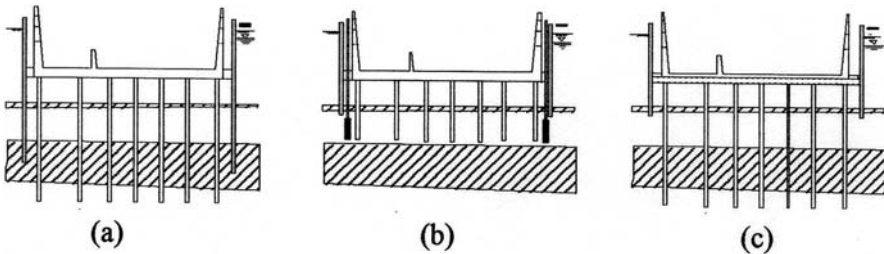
Underpass mr Bierensweg and geotechnical section.
